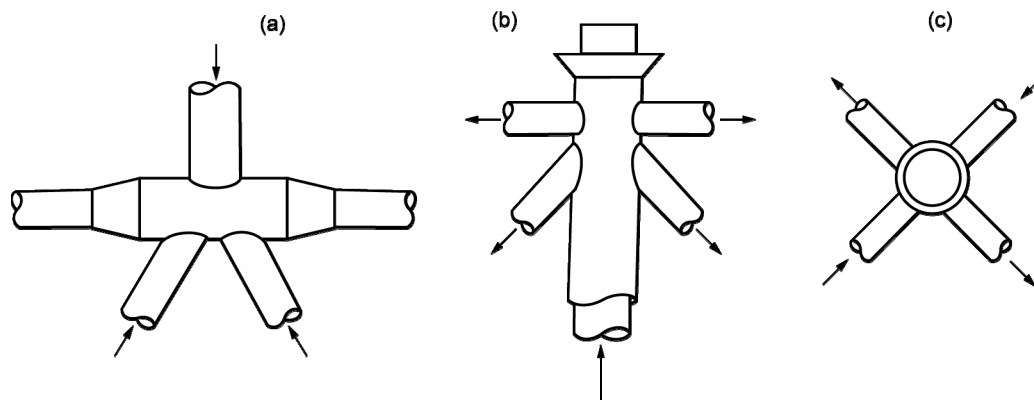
Adverse Load Patterns with α Up to 3.8 (a) False Leg Termination, (b) Skirt Pile Bracing, (c) Hub Connection
